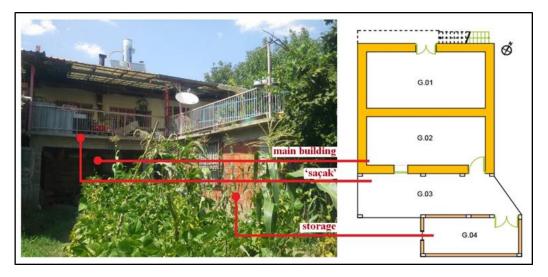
In the photo and the ground floor plan of the H18; the relationship between the additional storage, 'saçak' and the main house.
